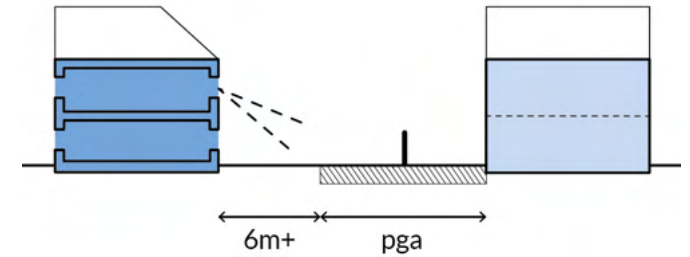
Where existing gardens are shallow, the remaining area should still benefit from the same level of protection, with new windows no closer than 6m to the edge of a *protected garden area*.
